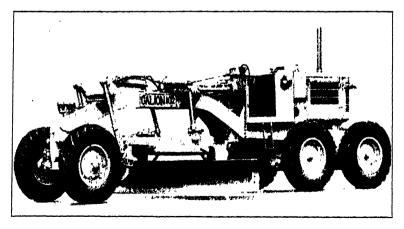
Motor grader "motor patrol." (Shaping subgrades and surfaces, soil mixing.) Courtesy of the Galion Iron Works and Manufacturing ('ompany.
